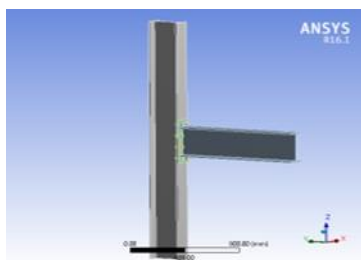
8mm thick plate connection arrangement with equal bolt distance
